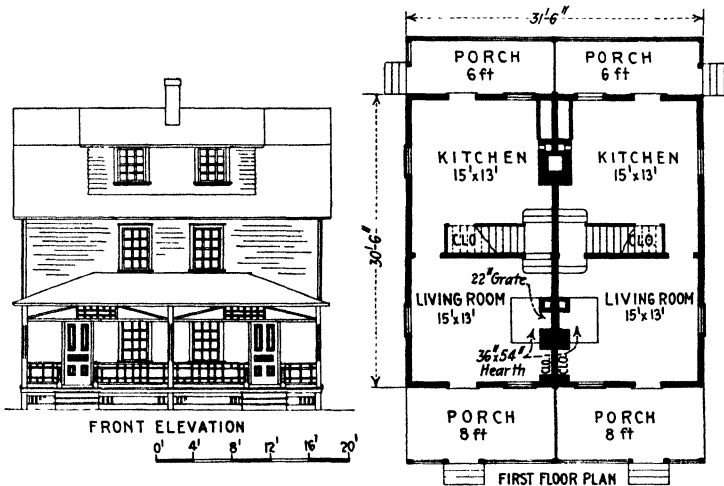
DOUBLE SIX-ROOM HOUSE.
